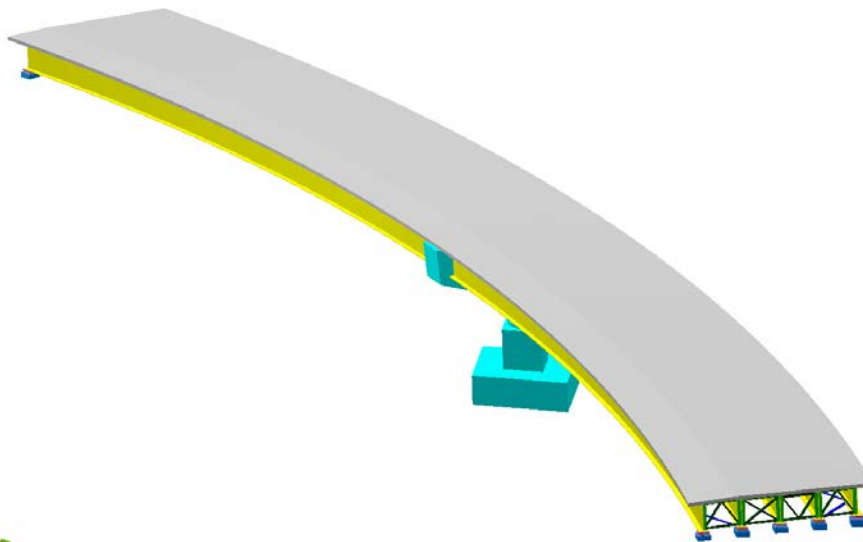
3D View of the Steel Case Study Bridge 2
